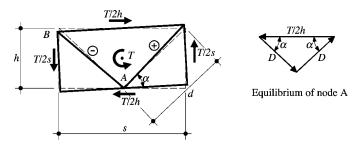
Forces in the diagonals of the truss cross bracing of a closed section bridge.
